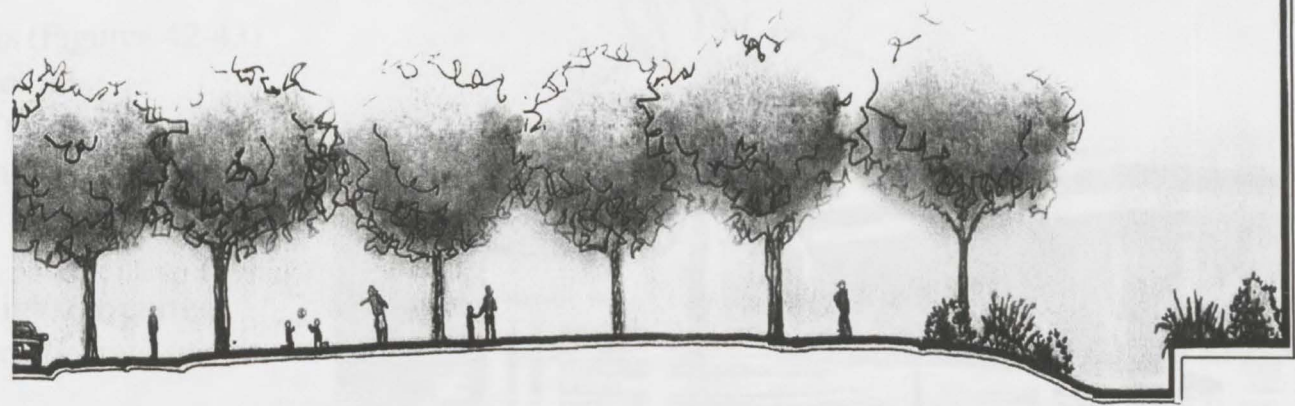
Section through 'outdoor classroom' between building and 18th Avenue showing tree planting
